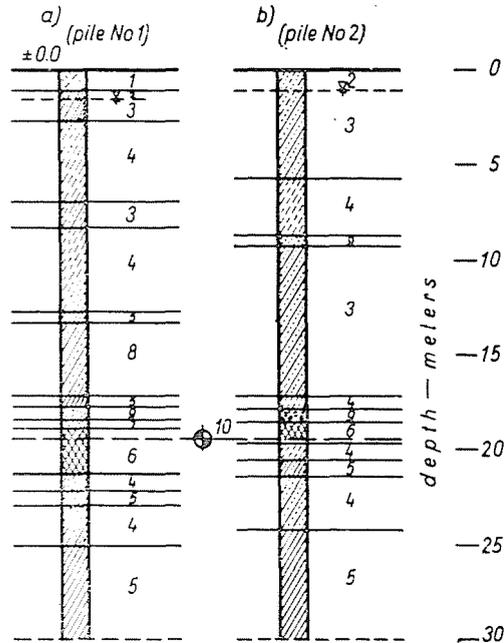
Boring logs at the site of test piles: a — boring No. 1; b — boring No. 2; 1 — fill; 2 — groundwater table; 3 — silty fine sand; 4 — silt; 5 — clay; 6 — hard clay; 7 — organic; 8 — silty fine sand; 9 — sand, gravel, 10 — plane of the pile base
